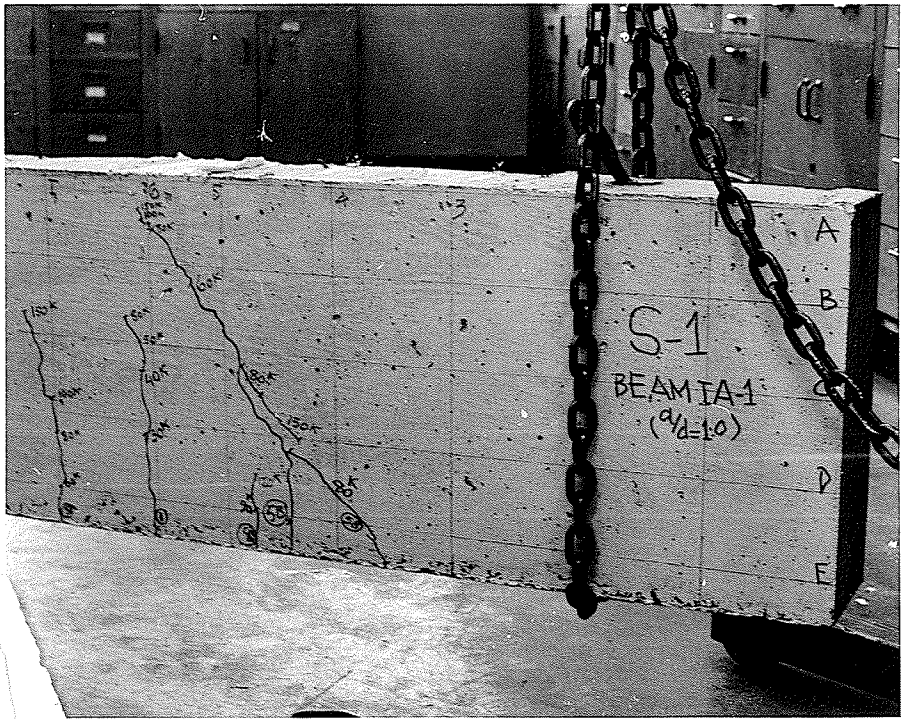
CRACK LOCATIONS ON SIDE S1 OF BEAM IA-1
